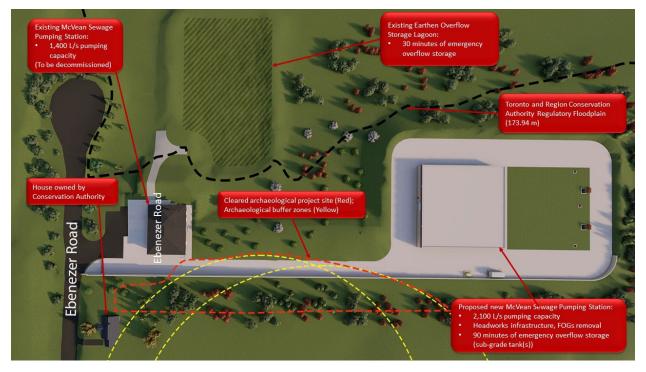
Layout Plan of the Preferred Alternative for the McVean SPS Project
